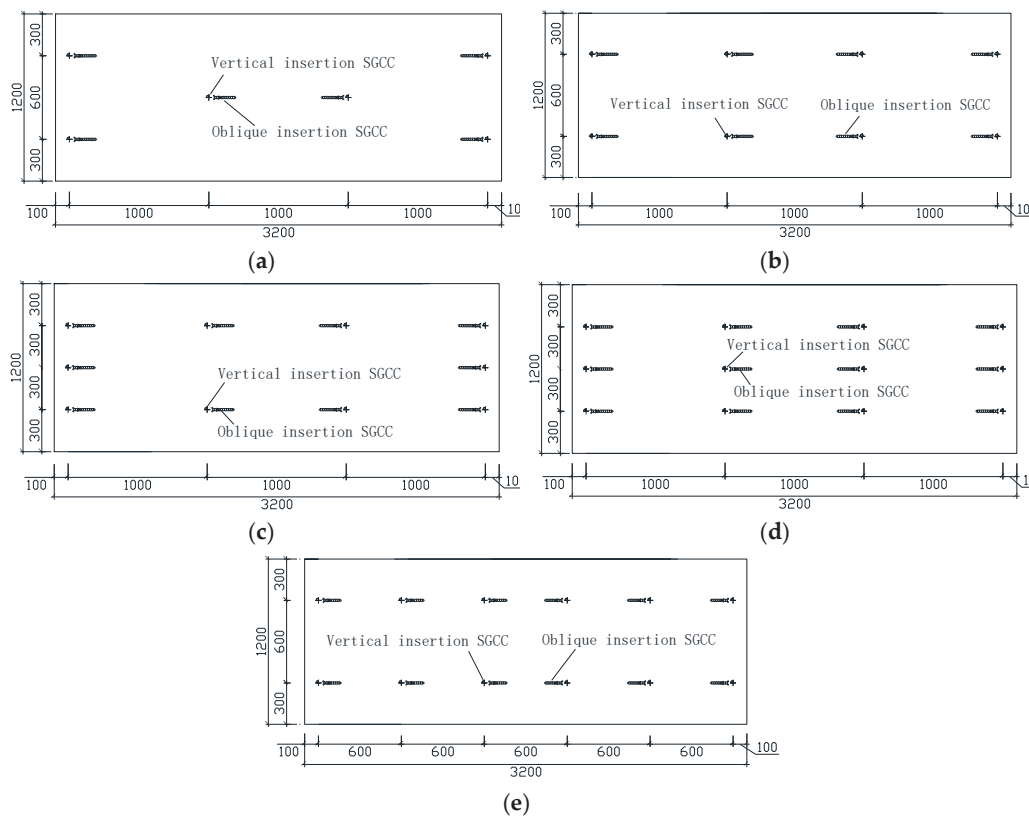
Plan view of the five test sandwich wall panels (all dimensions in mm): (a) P1 (2-1-1-2); (b) P2 (2-2-2-2); (c) P3 (3-2-2-3); (d) P4 (3-3-3-3); (e) P5 (2-2-2-2-2-2).
